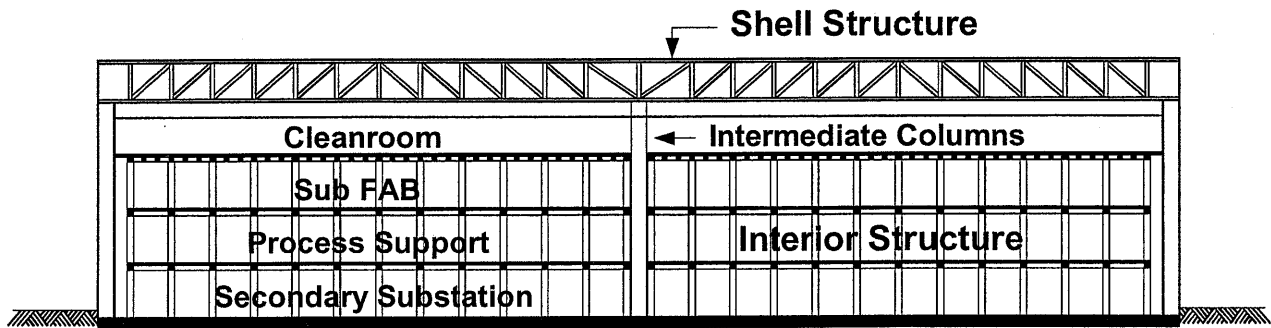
Plan view of a typical IC fab structure in Taiwan
